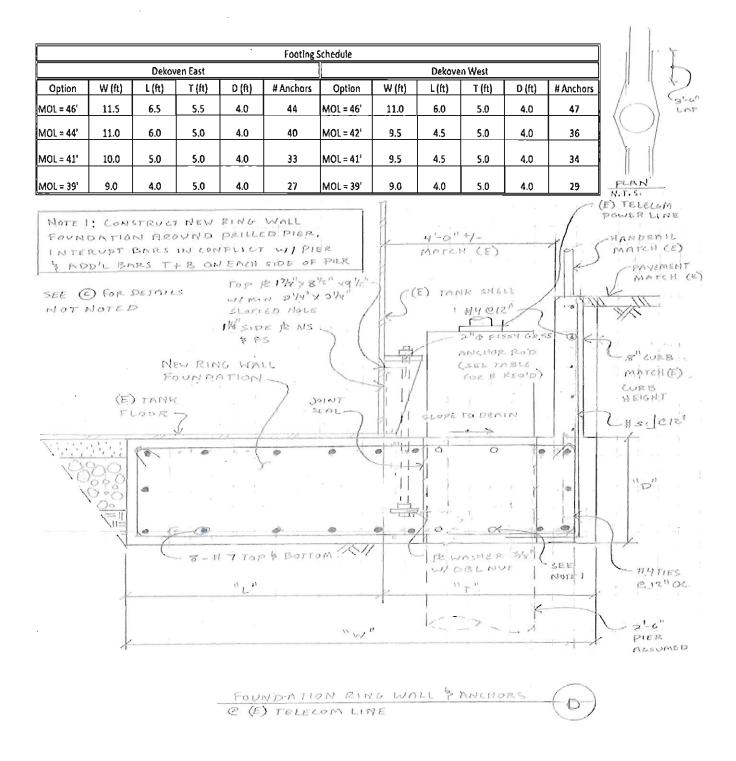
Foundation Ring Wall & Anchors at Cell Phone Tower
